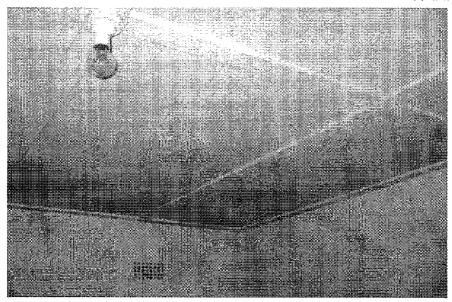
Asbestos cement sheeting located on the ceiling of the laundry of the residential tenancy at 16 Bruce Street.
